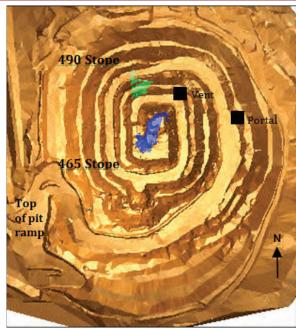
Open pit plan view with crown pillar stope outcrops
